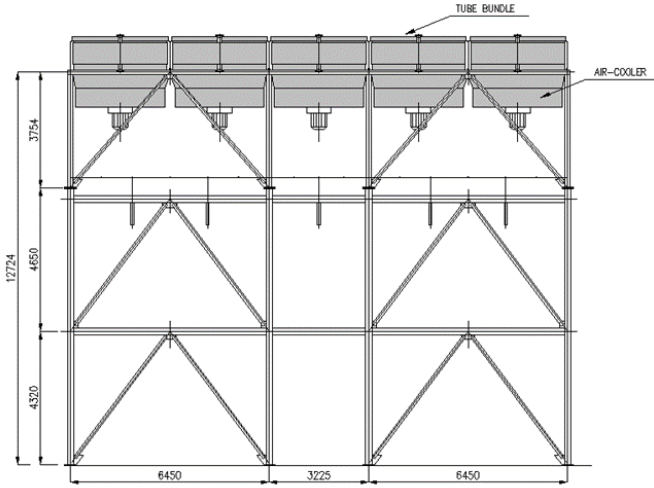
Longitudinal view of the structure: air-cooled heat exchangers placed at the top of a steel supporting structure
